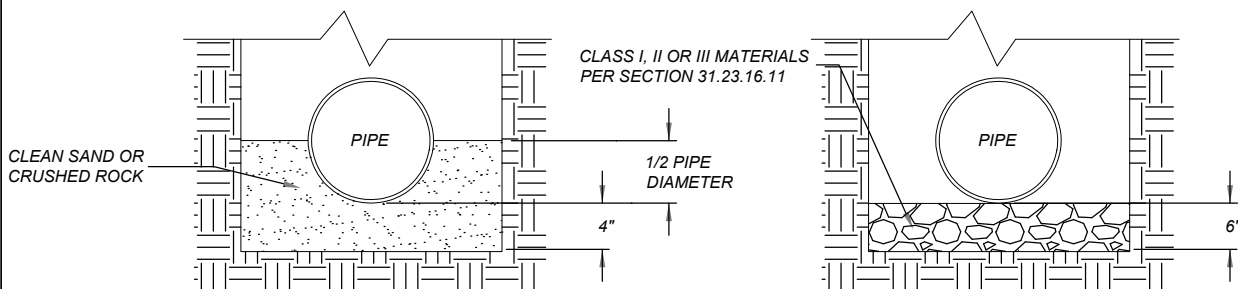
TRENCH-TYPICAL & ALTERNATE
